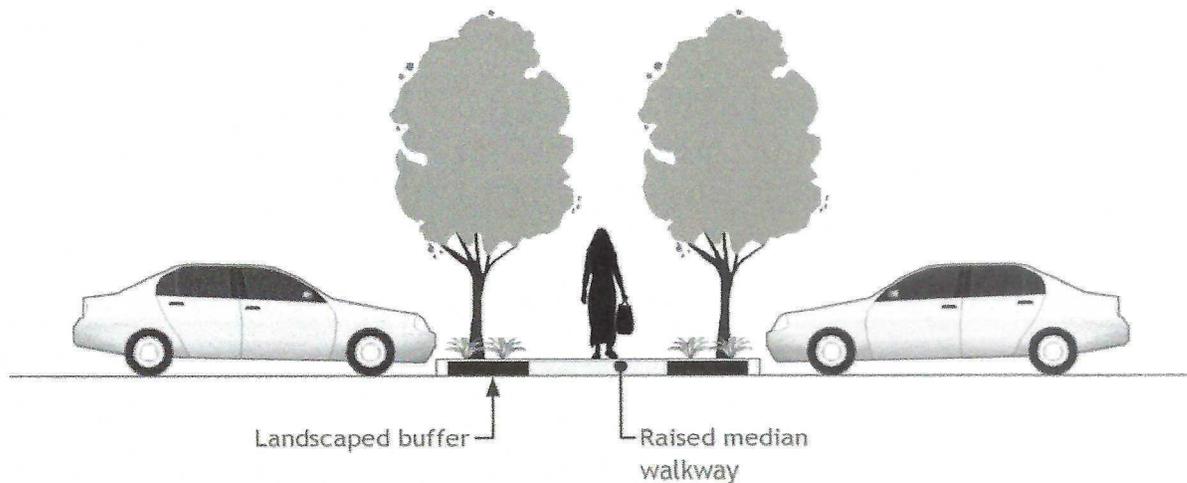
C: Pedestrian Walkways in Parking Lots
